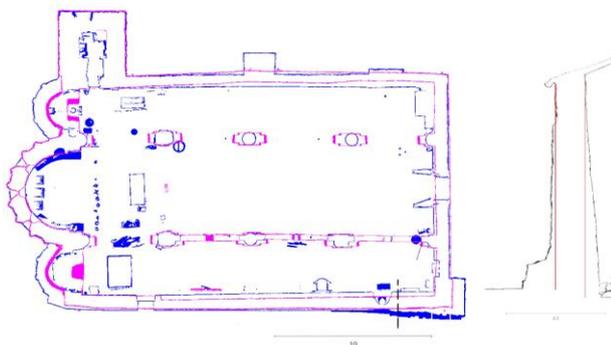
Church of Sorano: Overlay of the floor plans at elevations +1.00 (blue) and +5.00 (magenta).
